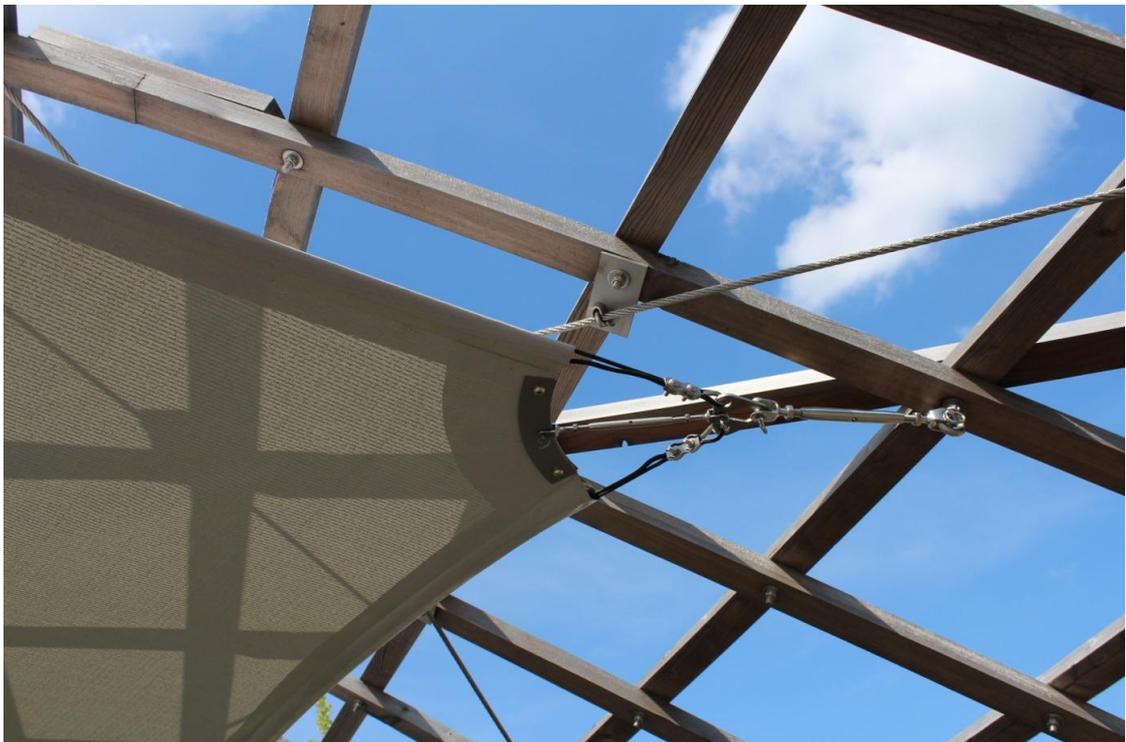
Membrane anchoring detail to the perimeter in points, 2016, Třebešov [by author]
